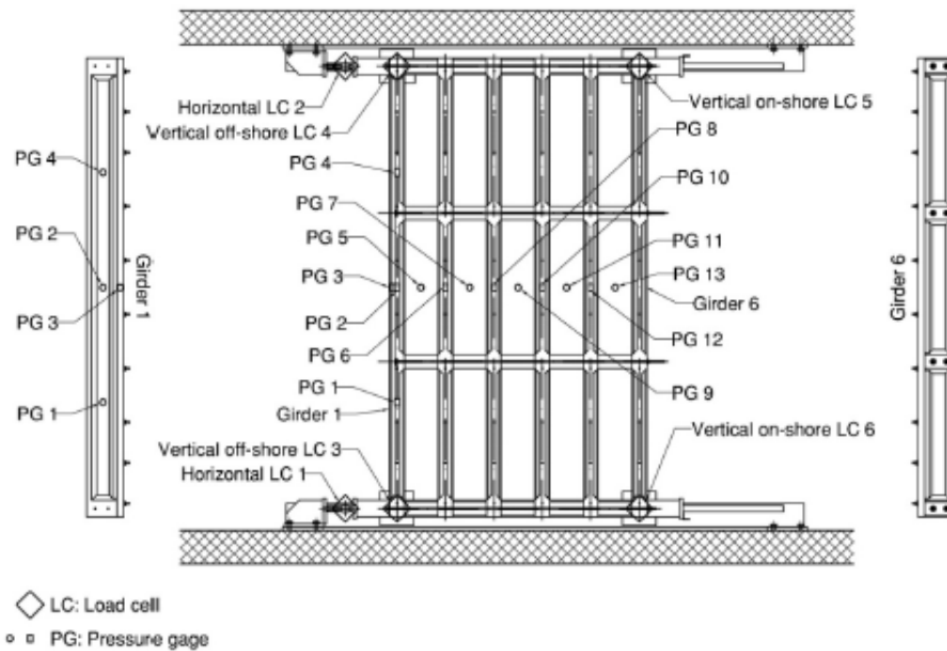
Instrumentation plan for Escambia Bay Bridge Model (Schumacher, 2009)
